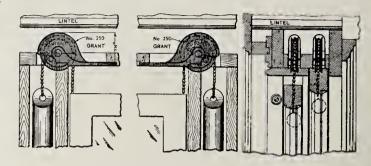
SINGLE FRAME AND SECTION OF PULLEY.
